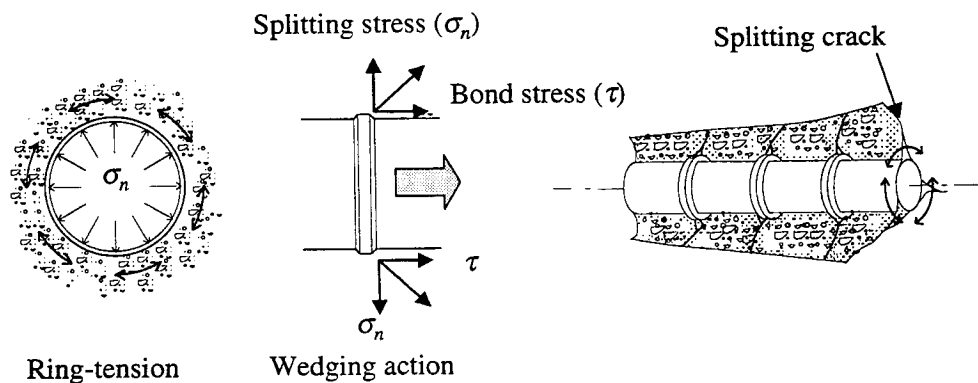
Wedging action and bond splitting cracks in deformed bars
